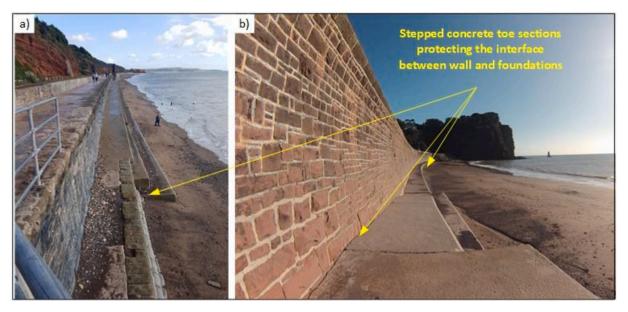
Stepped toe protection keyed into existing wall foundations providing increased resistance to scour. a) Granite faced wall near the site of the 2014 storm damage in Dawlish. b) A section of original sandstone seawall near Holcombe, Dawlish.
